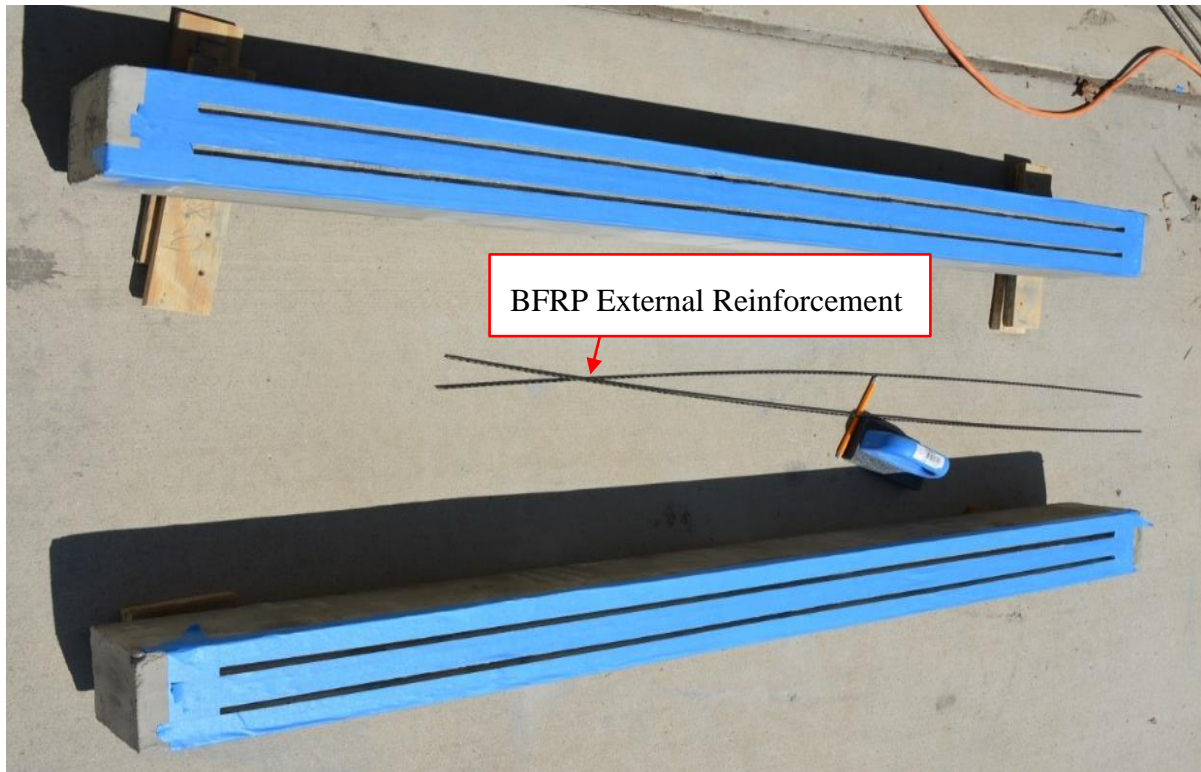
Two Beams Ready for Epoxy Sikadur 30 and 2-4mm External BFRP Reinforcement
